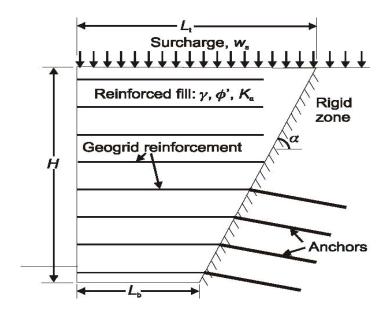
General representation of the reinforced soil retaining wall problem with constrained reinforced fill zone
